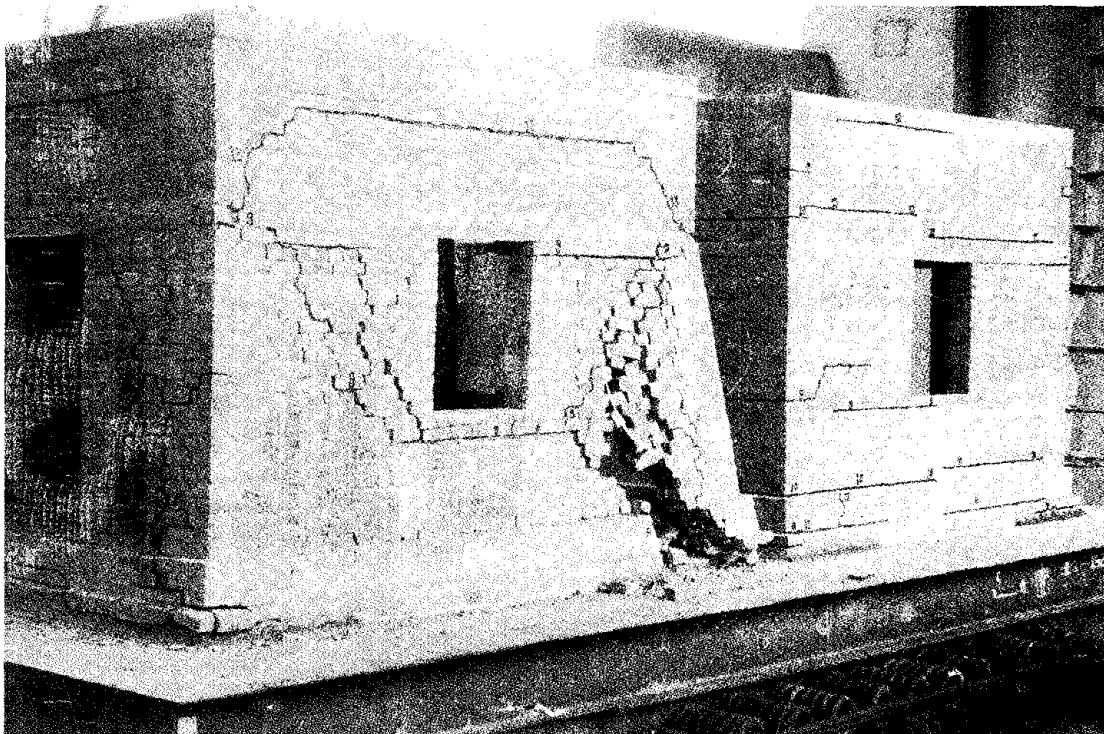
Reinforced Mud Failure, Reinforced Cement Standing
